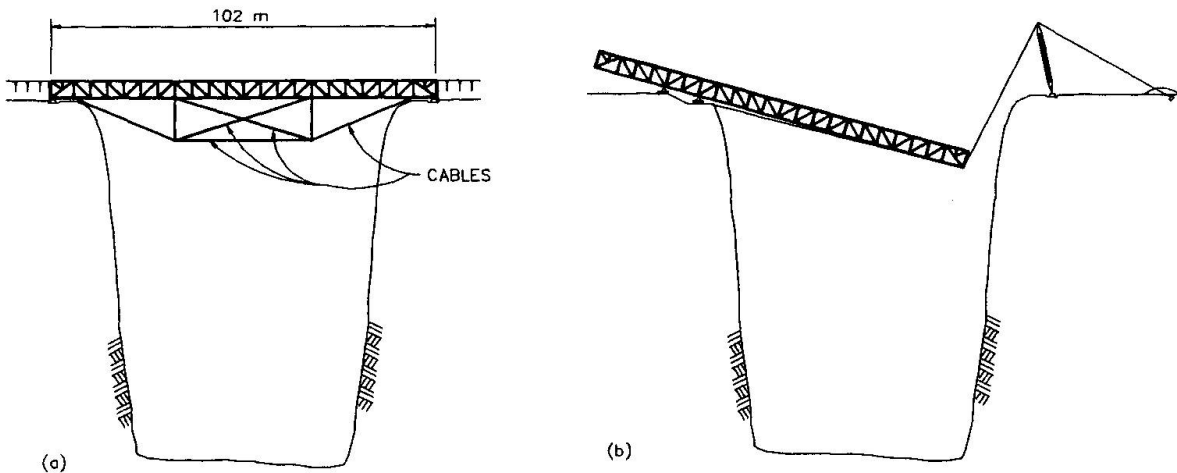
Pashleth Creek Bridge, (a) elevation, (b) designer's proposed erection scheme.
